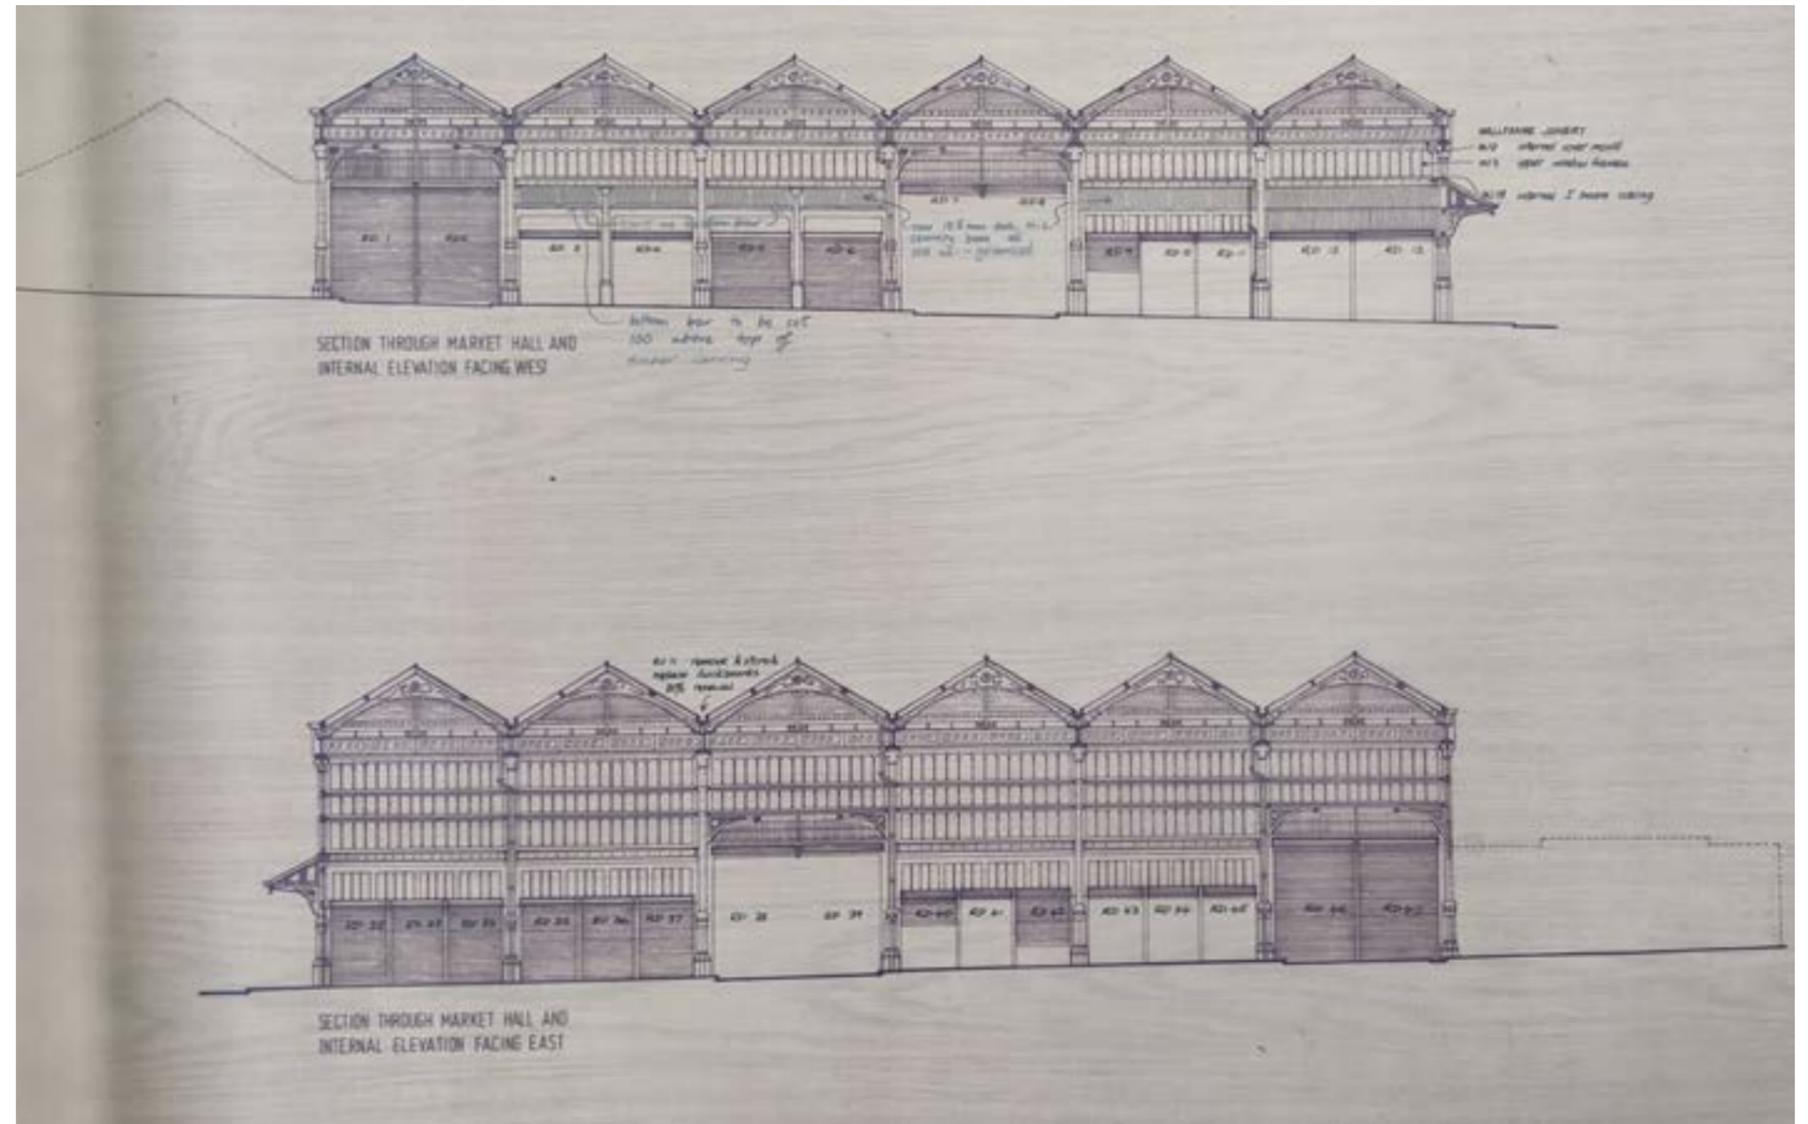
Existing Internal elevations: repairs component location plan 1979 © Kirklees Council
